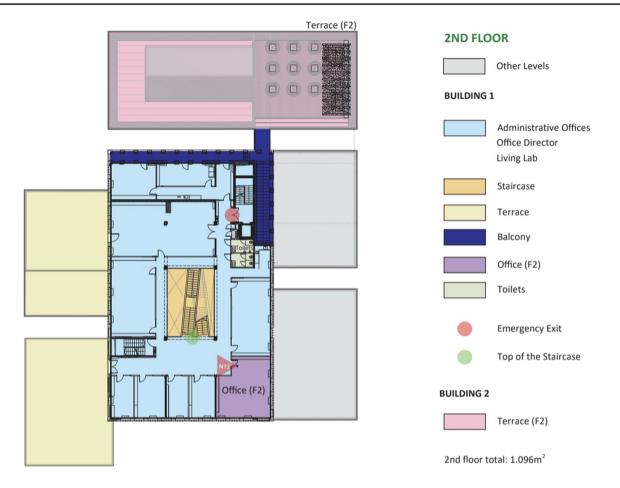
One of the 2D floor plans from the Innorenew CoE building
